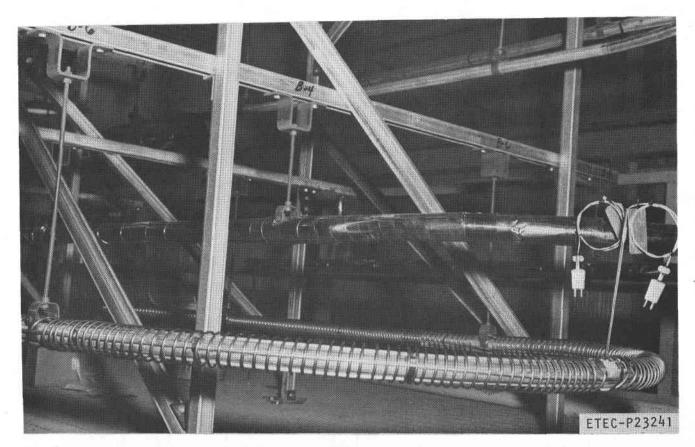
MI Cable Mounted on Spacers on a Curved Section of 1-in. Pipe
